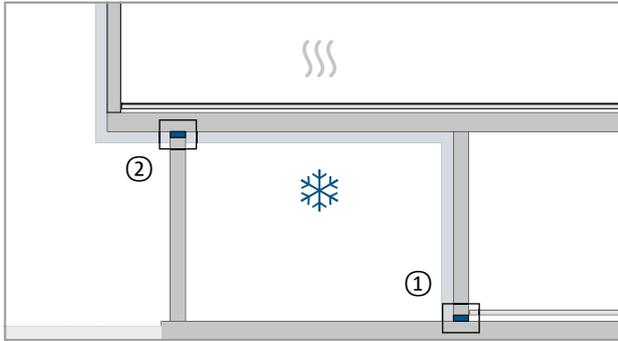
External underground garage walls and columns using Schöck Sconnex®
